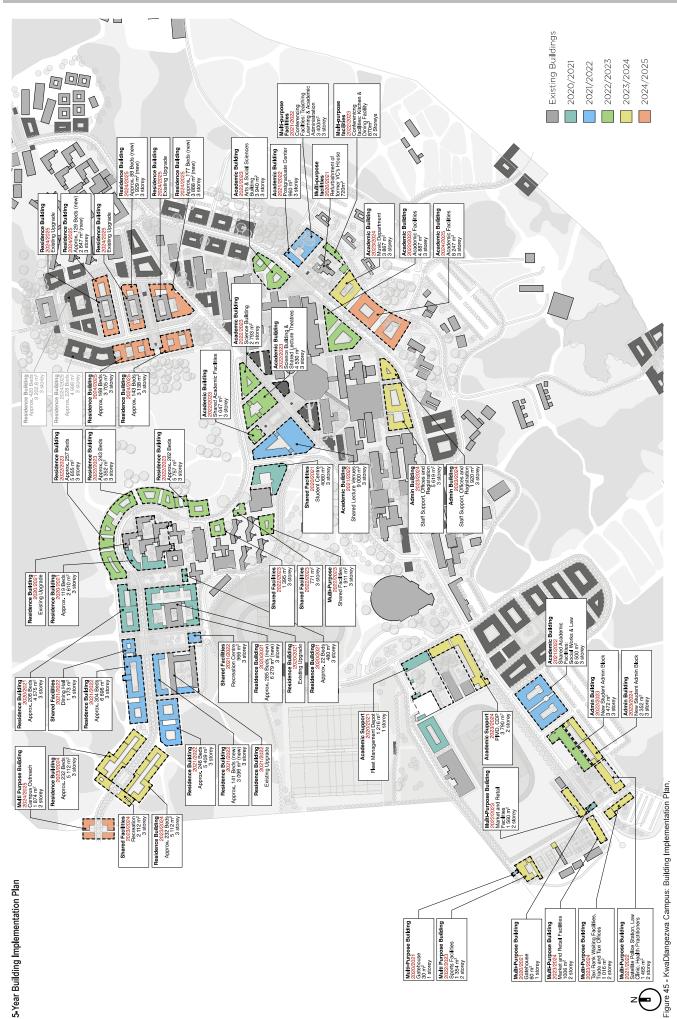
A: 5-Year Site Development Plan showing proposed infil buildings on the campus (Source: Ludwig Hansen Architects and Urban Designers).
